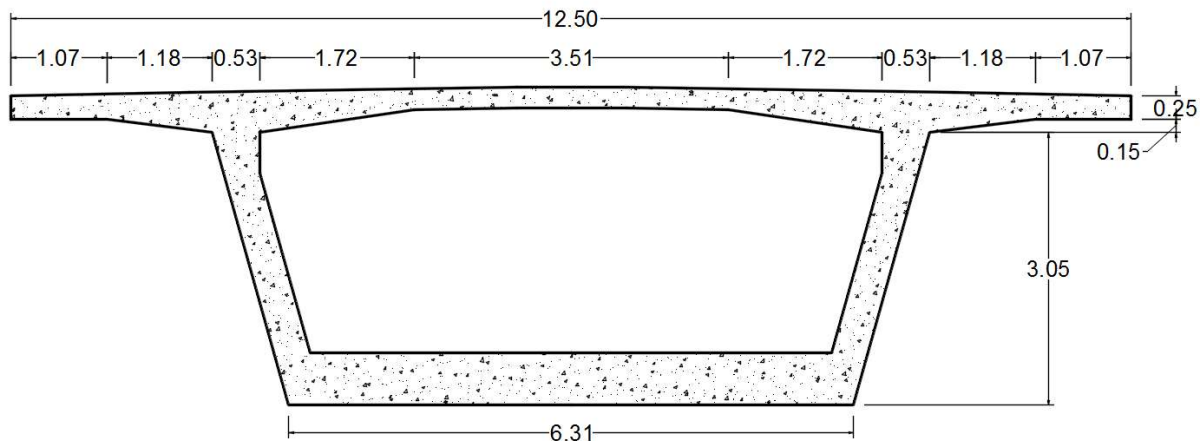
Sectional view of the Kishwaukee River bridge (units in meter)
